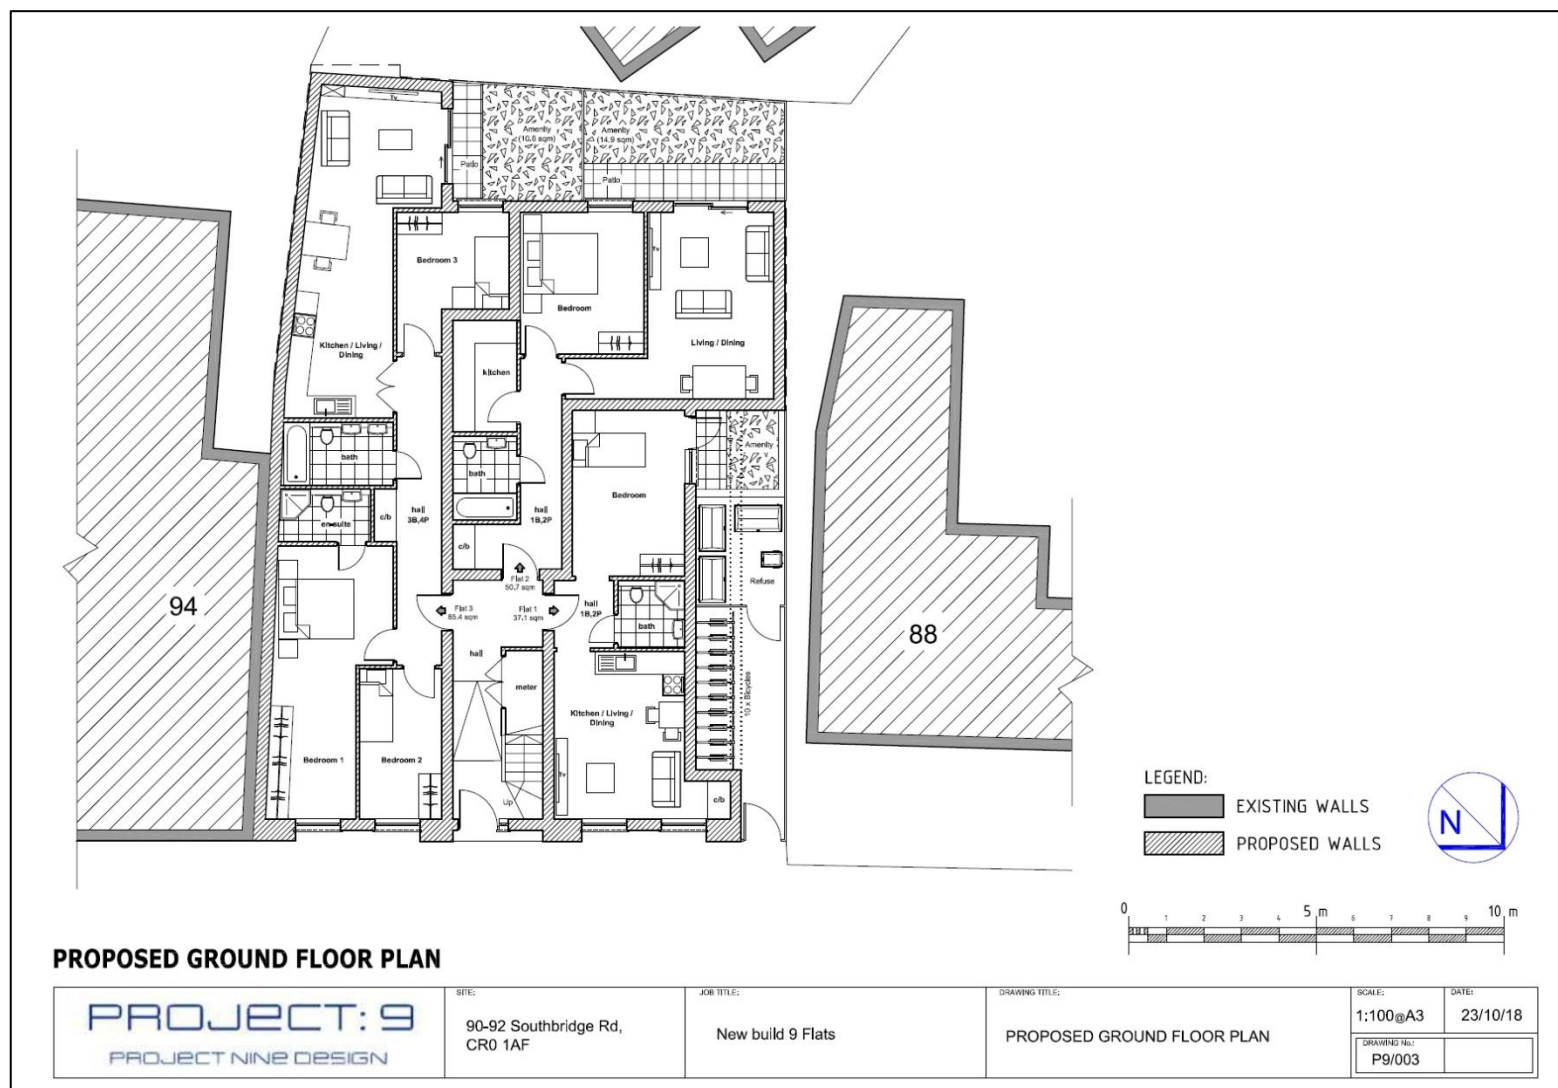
Ground floor plan of proposed new building at 90-92 Southbridge Road Croydon
